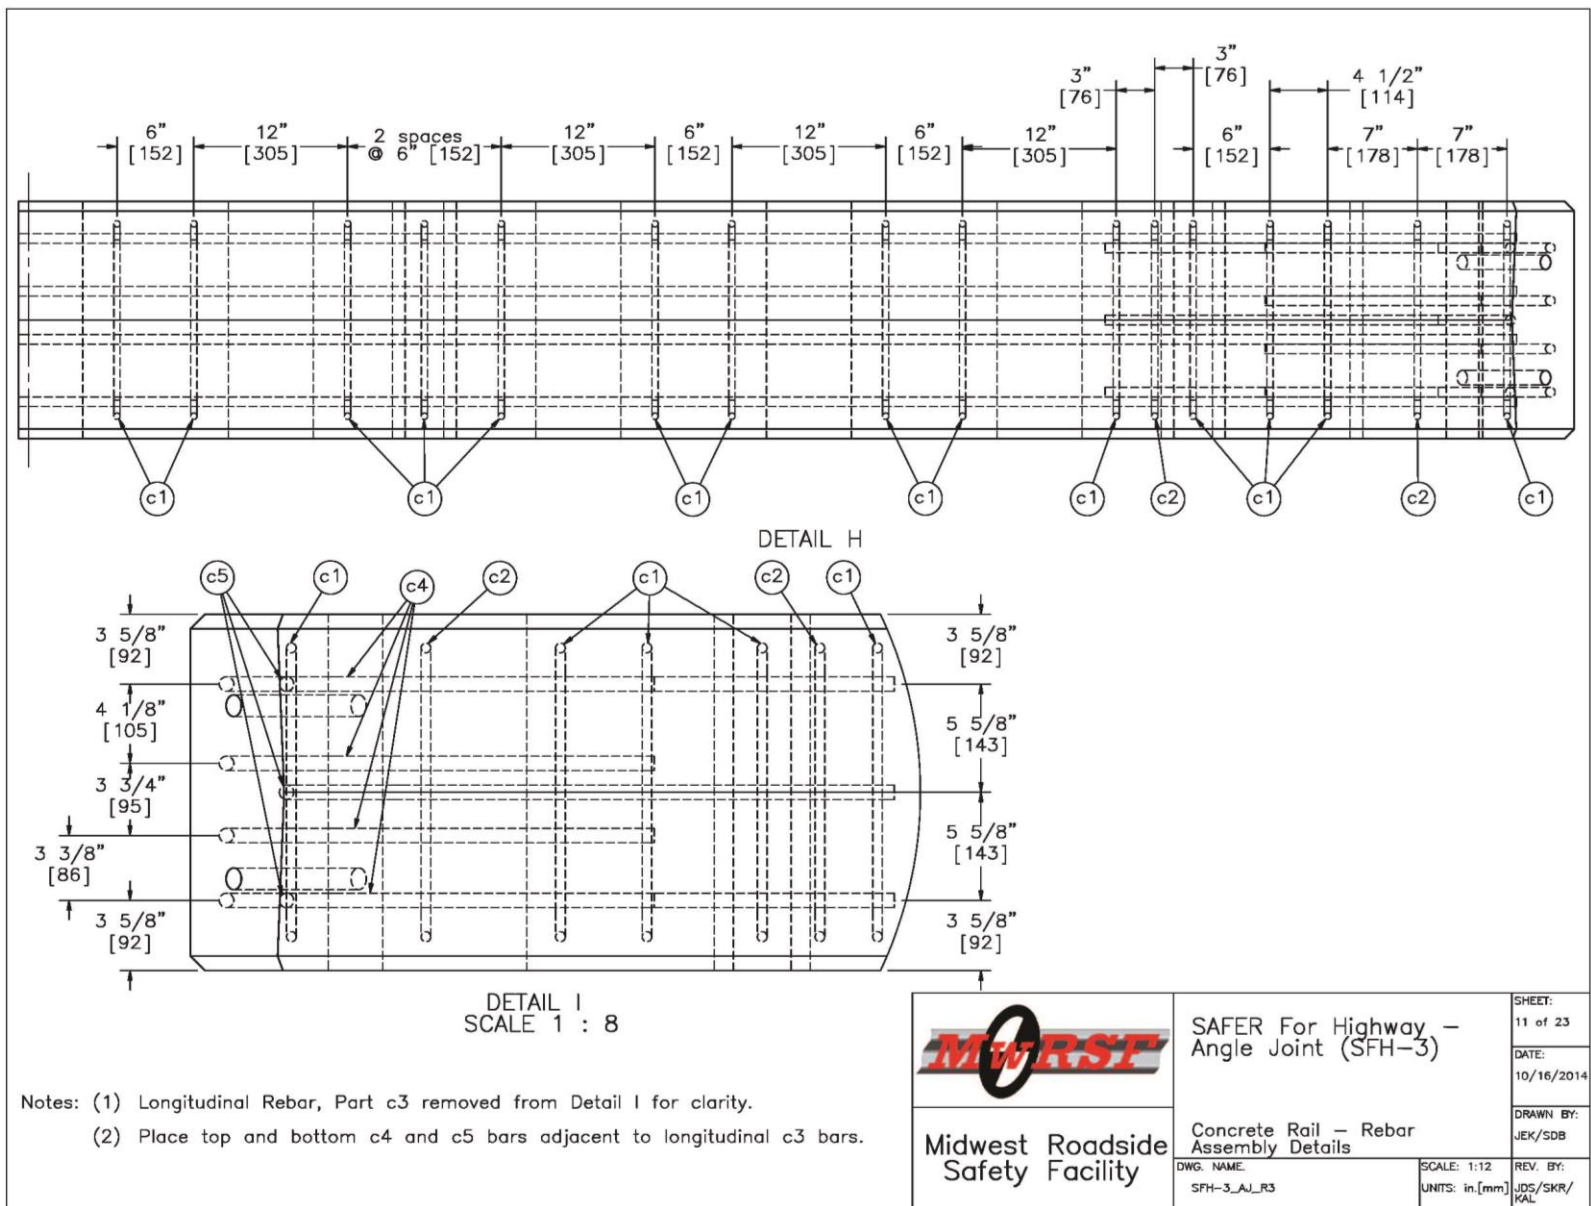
Concrete Beam, Rebar Assembly Details, Test No. SFH-3
